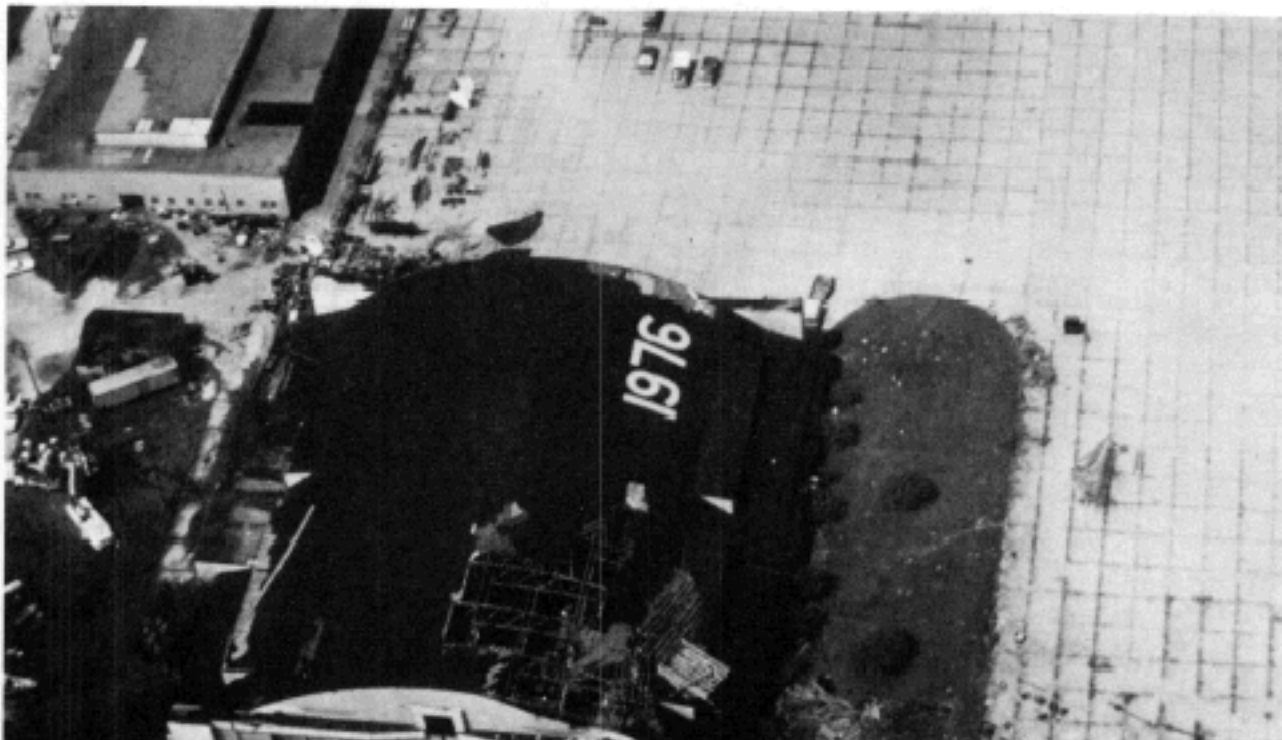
Wind damage to the roof of a hangar at Galveston Airport.
